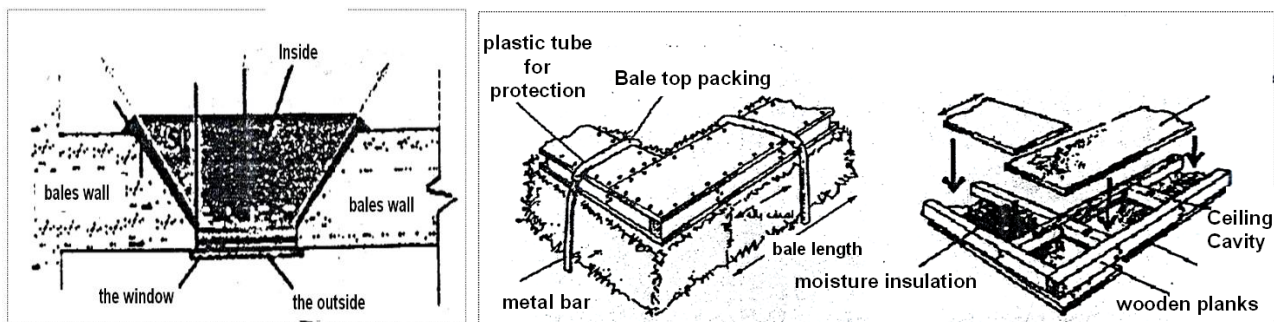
The slope angle of the opening inward is 45 degrees to allow the maximum amount of light to enter Fig. 27: Components of the roof anchor layer on the top of the bales wall (Source: [16]).
